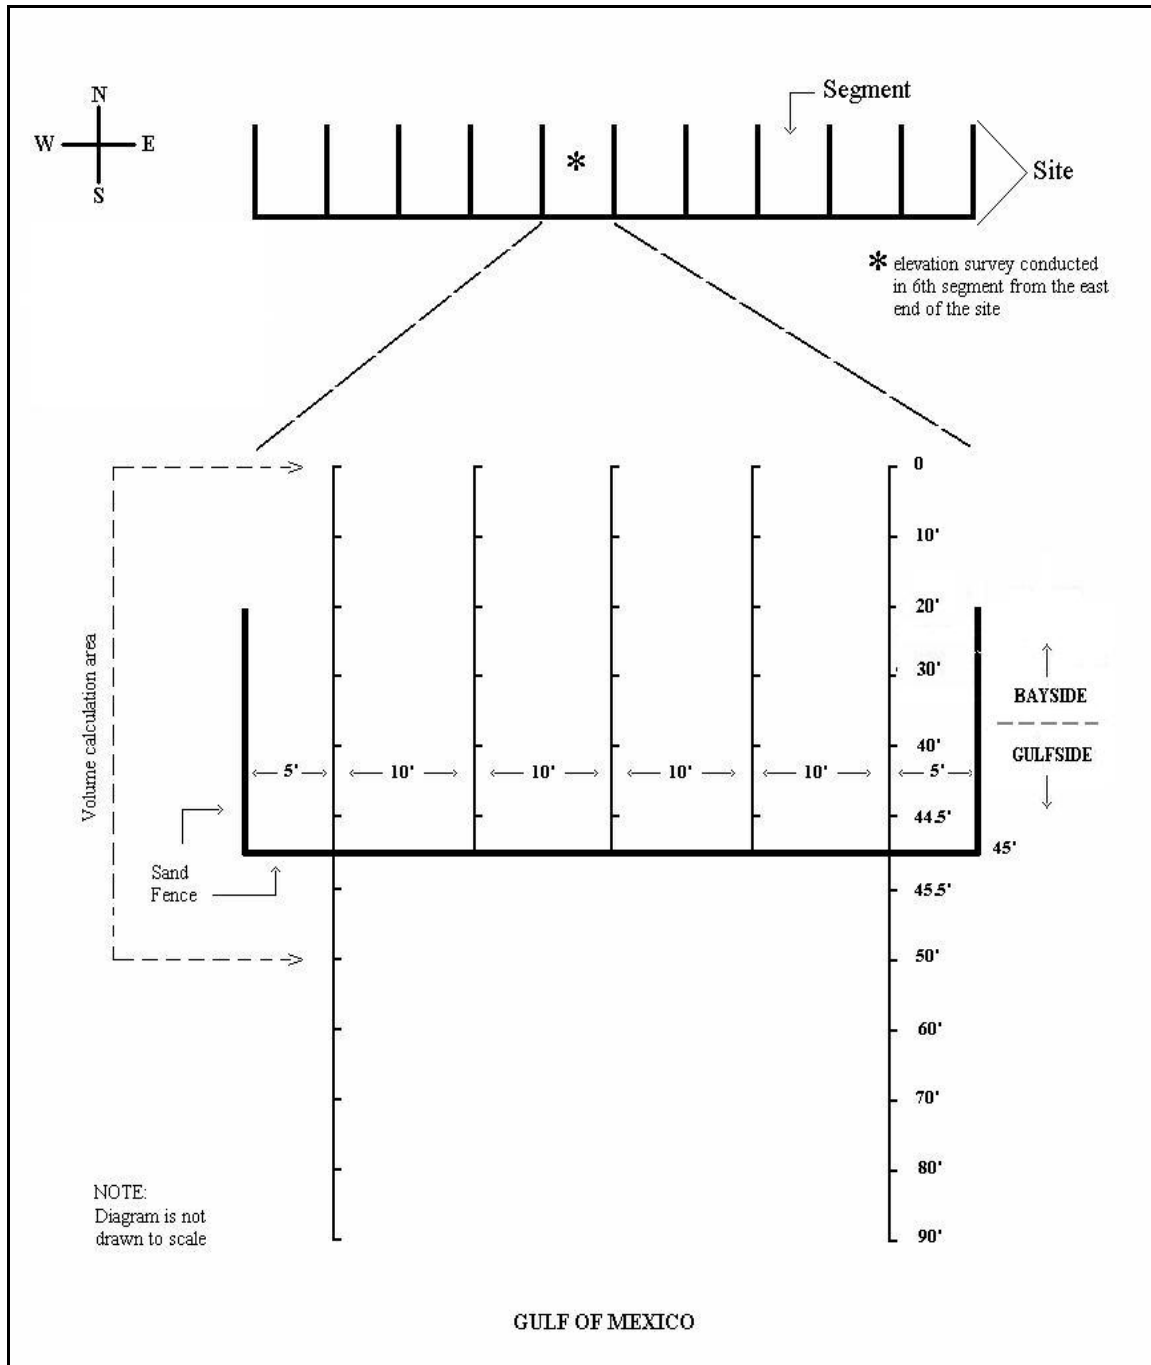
Typical elevational survey schematic within a segment at Timbalier Island Plantings (TE-18) Demonstration project.
